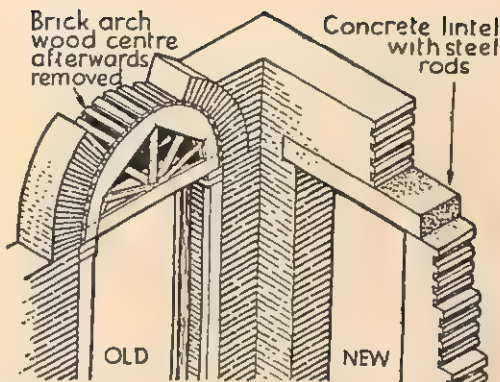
Old and new ways of bridging an opening in a brick wall.
